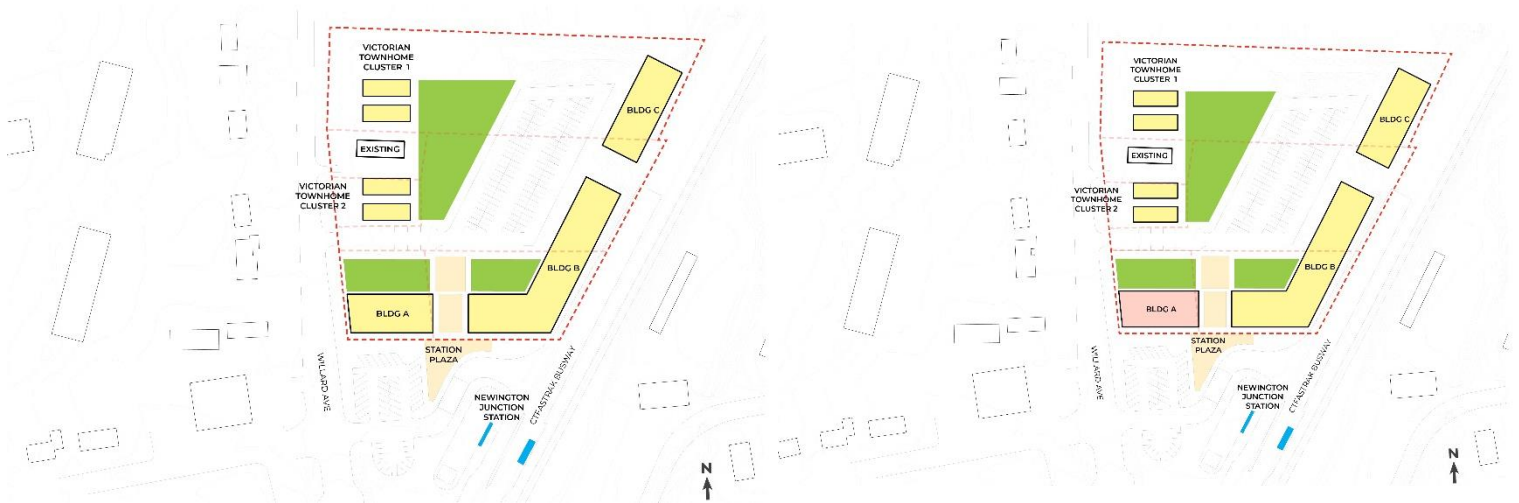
Newington Junction Station TOD Test-Fit Ground Floor and Aerial Plans
